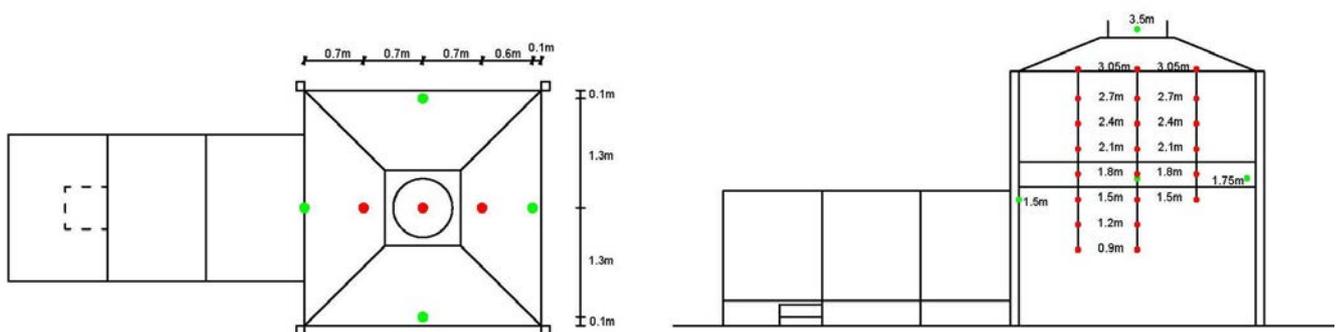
Positions of thermocouples; top view (left) and side view (right)
